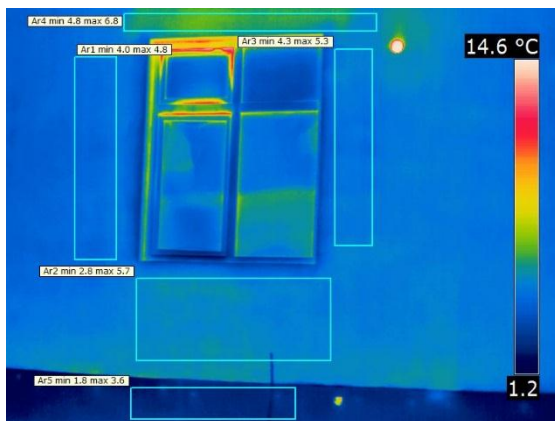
a) Thermographic image and photo of section of the front façade (streetside window) of the pilot rural house
